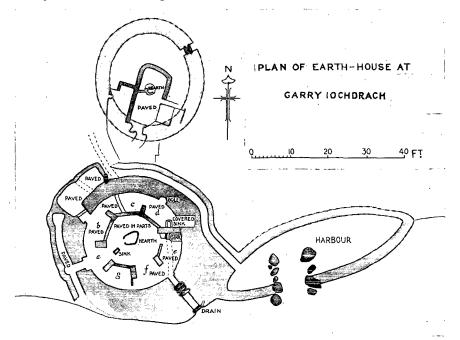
Plan of Earth-house at Garry Iochdrach, North Uist.
